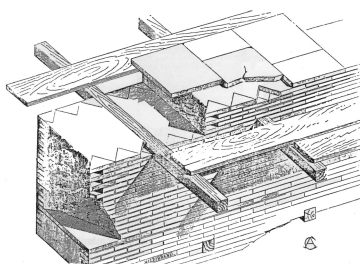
An *opus testaceum* masonry wall (from A. Choisy, 1873).
